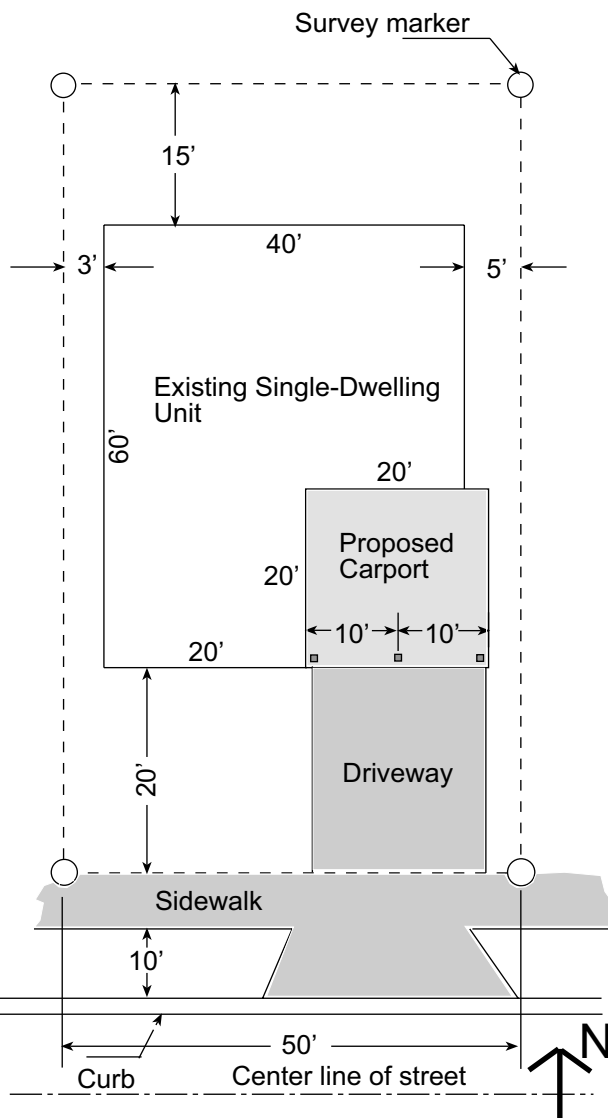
/Elevation view of CarportFigure 4/Sample Carport Plot Plan
